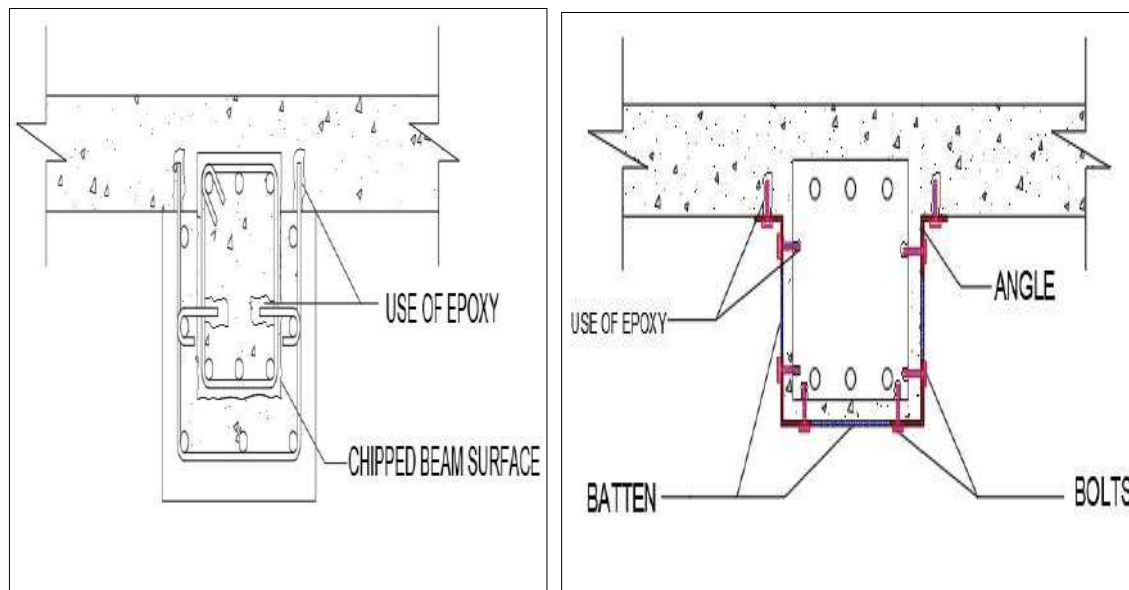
Typical cross-section of beam after RC jacketing and Steel jacketing
